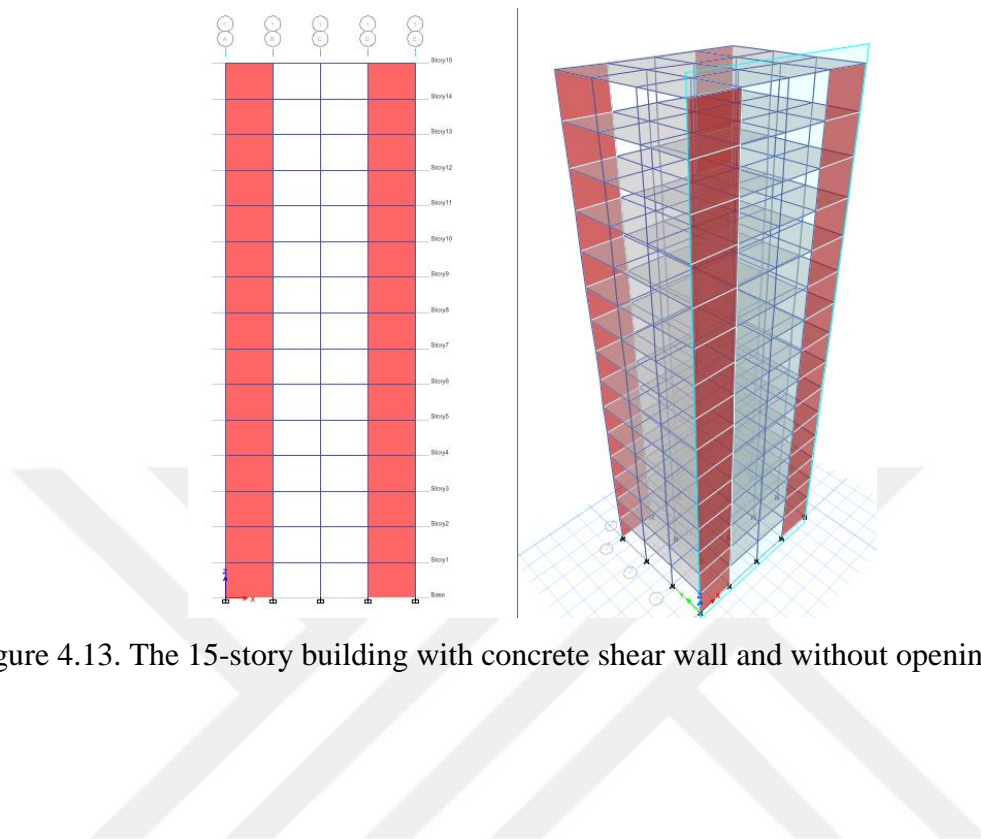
The 15-story building with concrete shear wall and without openings.
